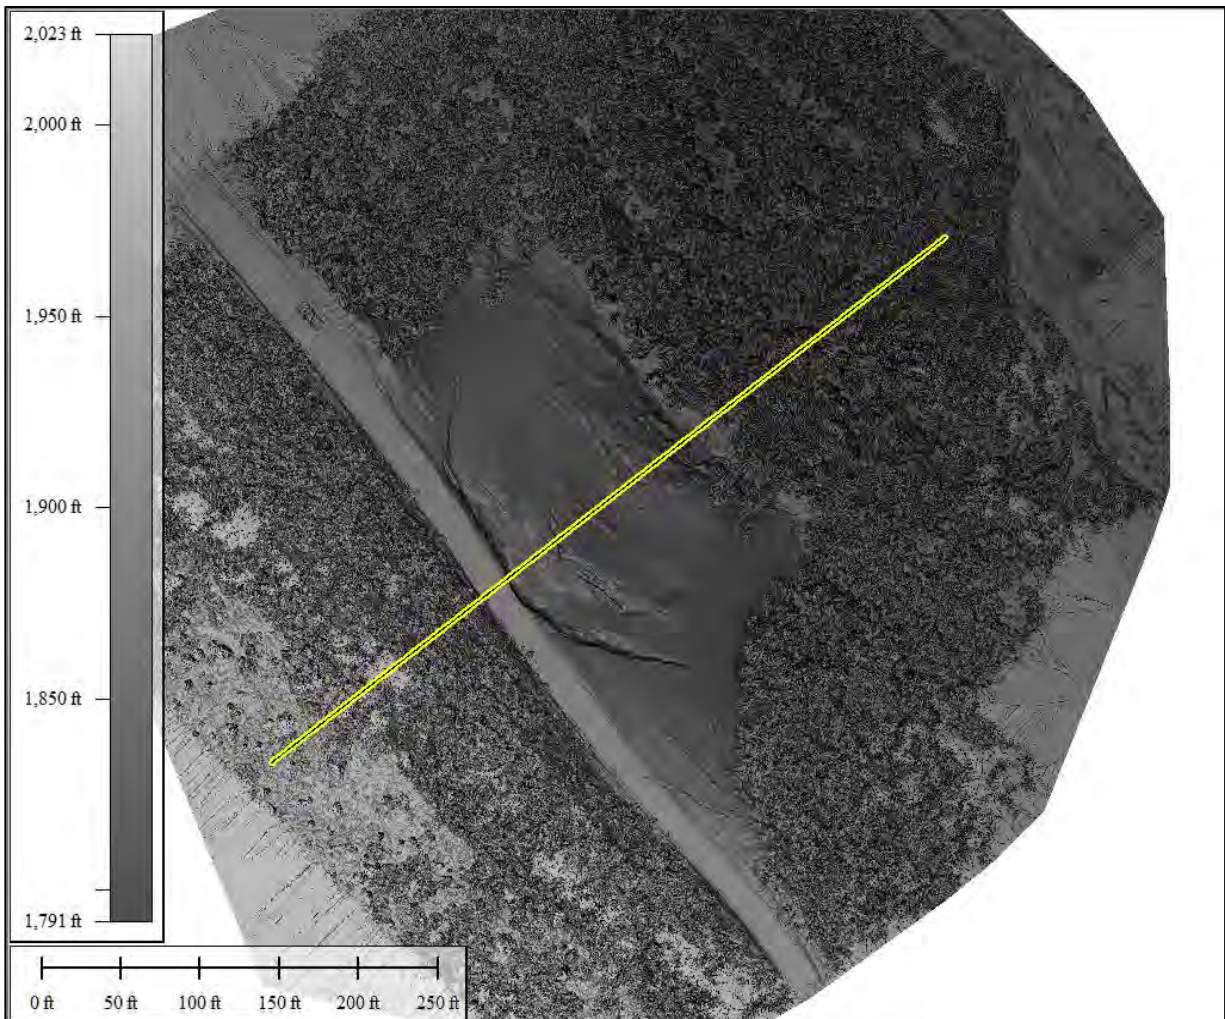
Photogrammetric Surface and Slope Stability Modeling Cross Section
